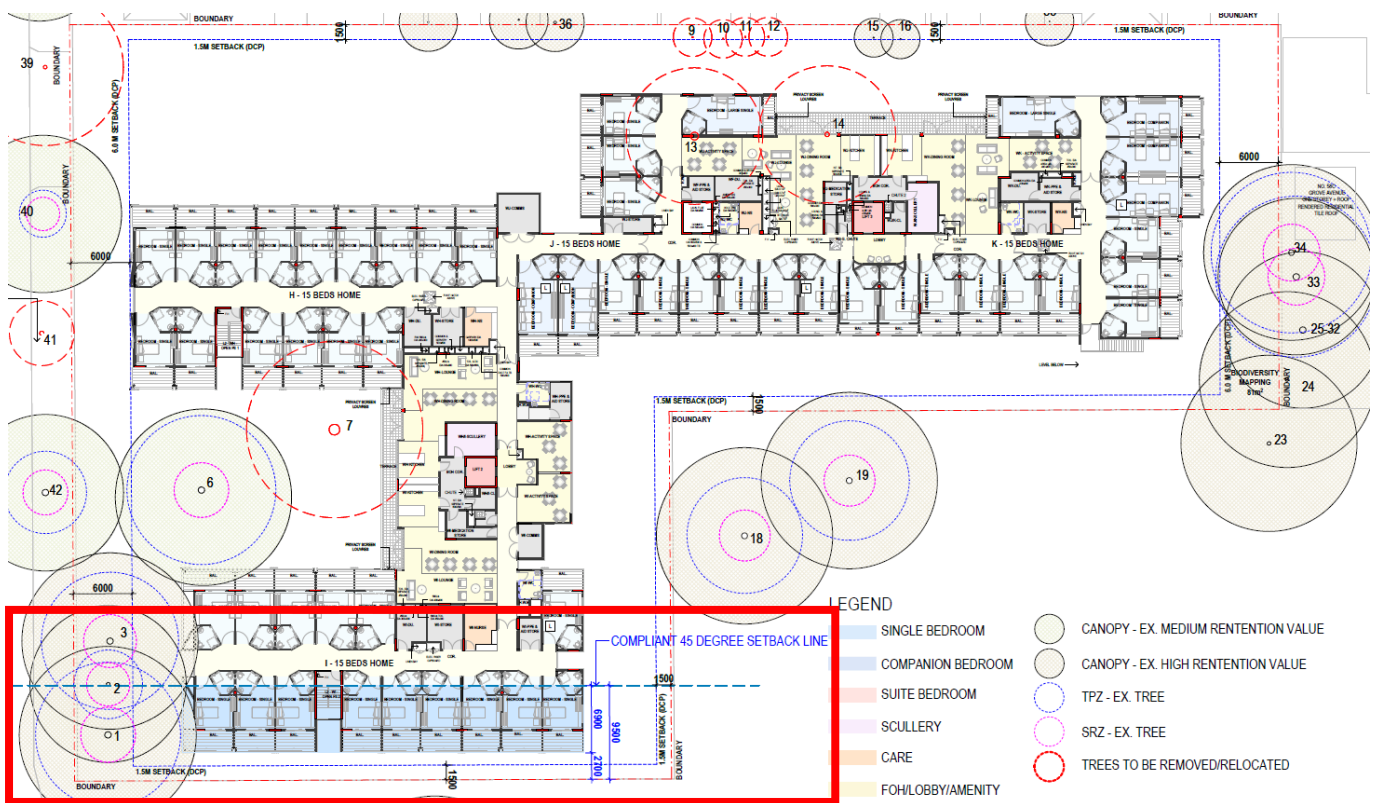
Level 2 floor plan illustrating the 45 degree setback line (dashed blue) and the removal of 9 rooms
